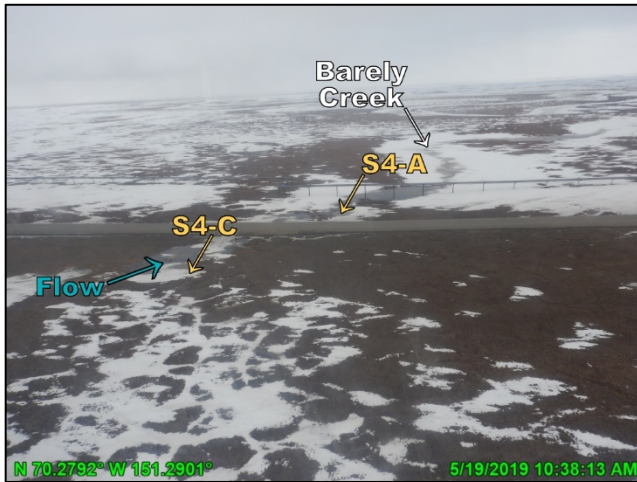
S4 monitoring site and Barely Creek drainage area, looking north; May 19, 2019
